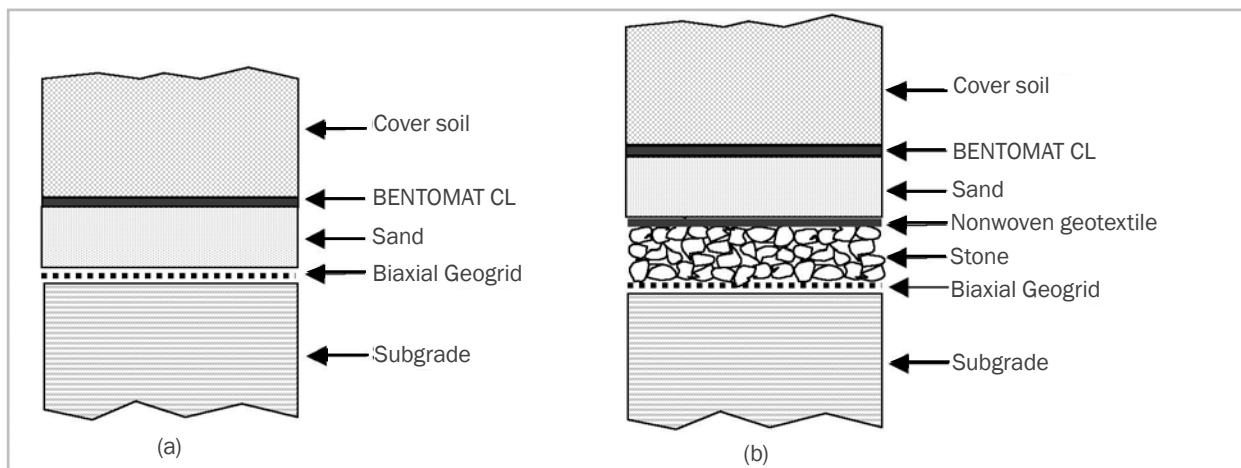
Use of geogrid and geotextile to reinforce unstable subgrade soils.
